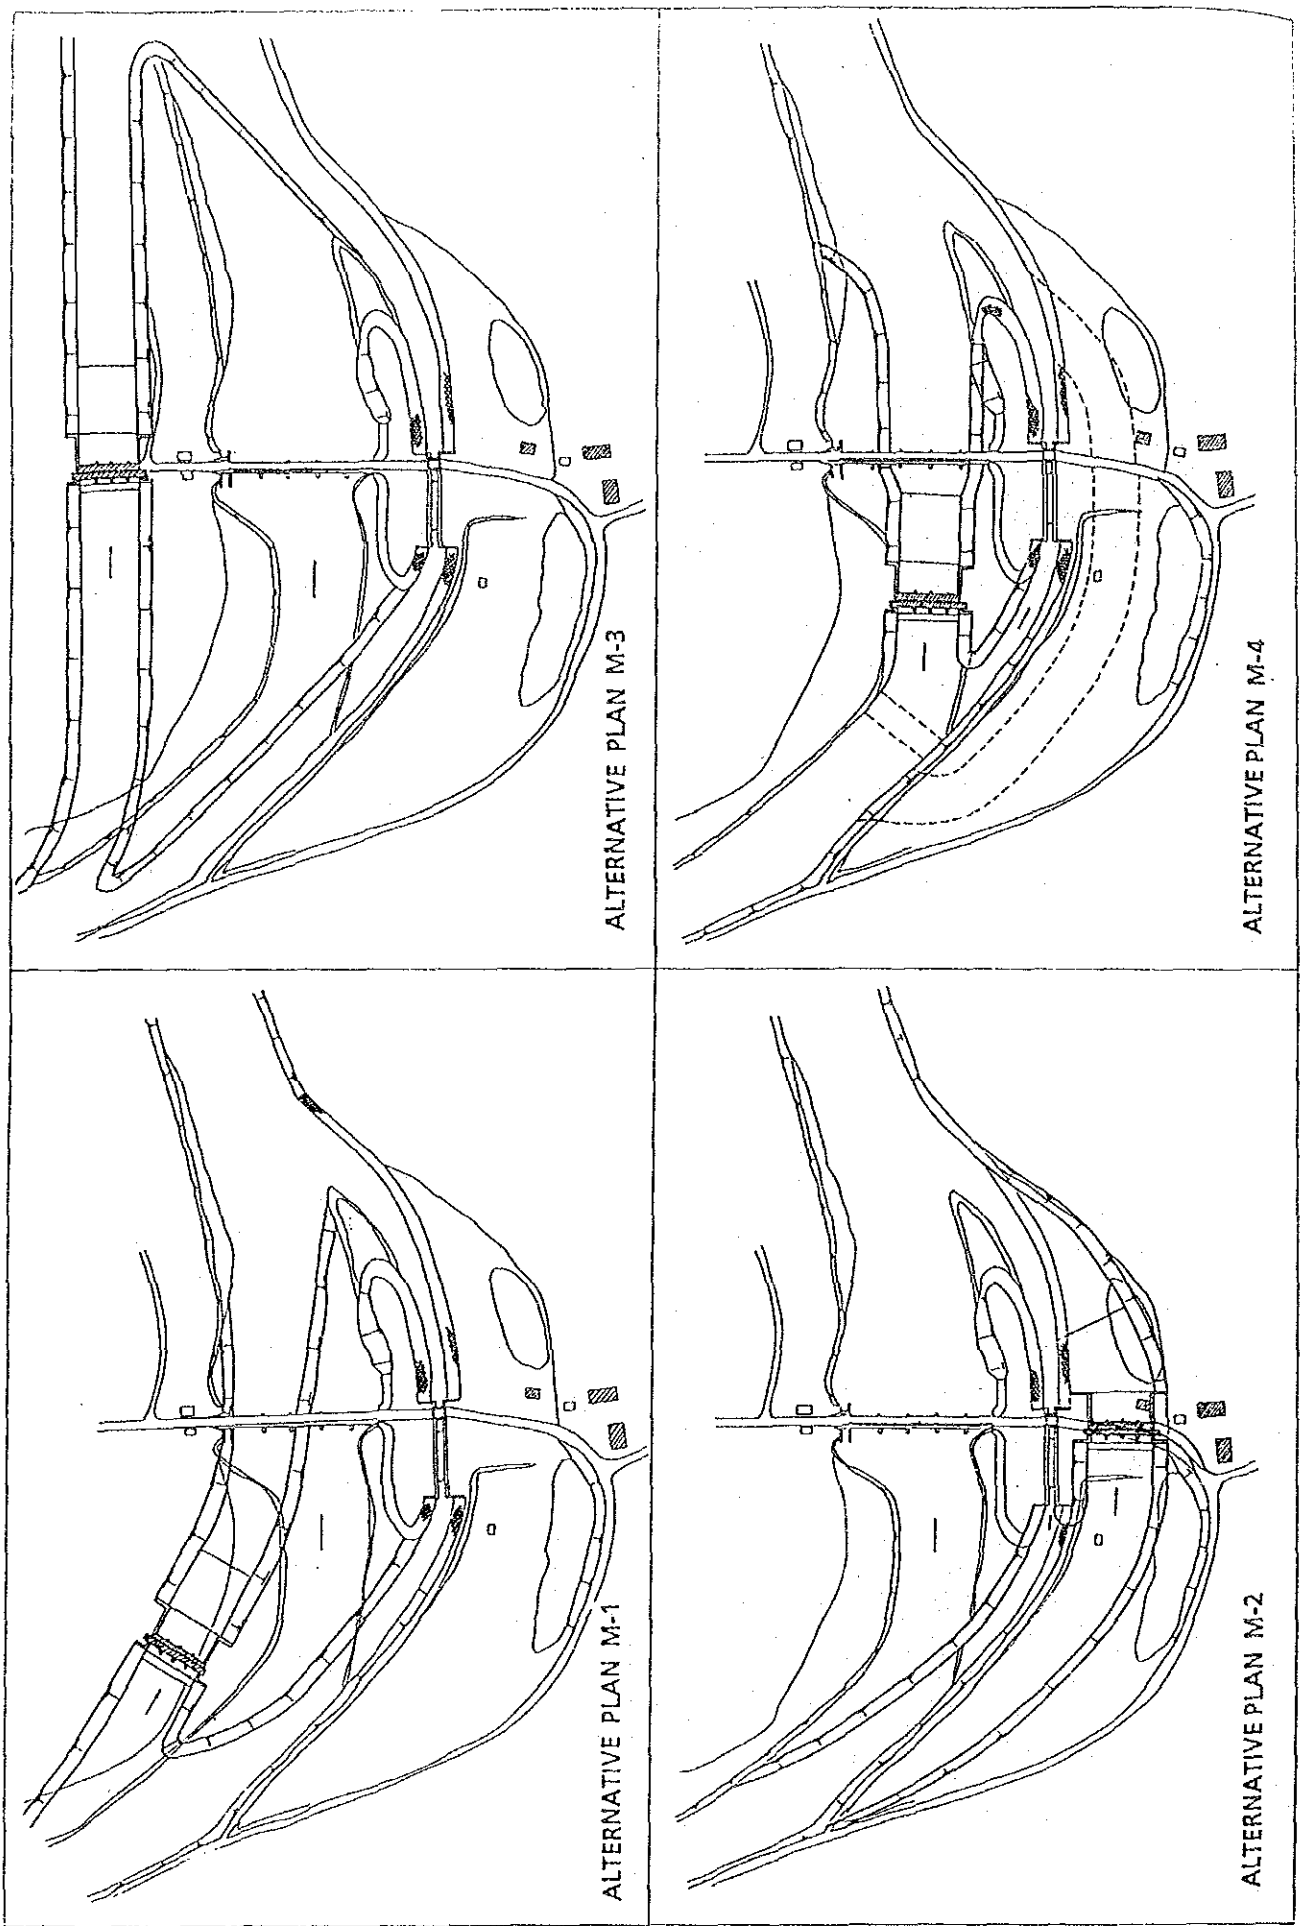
Alternative Plan of Proposed Site (Lahoun Regulator)
